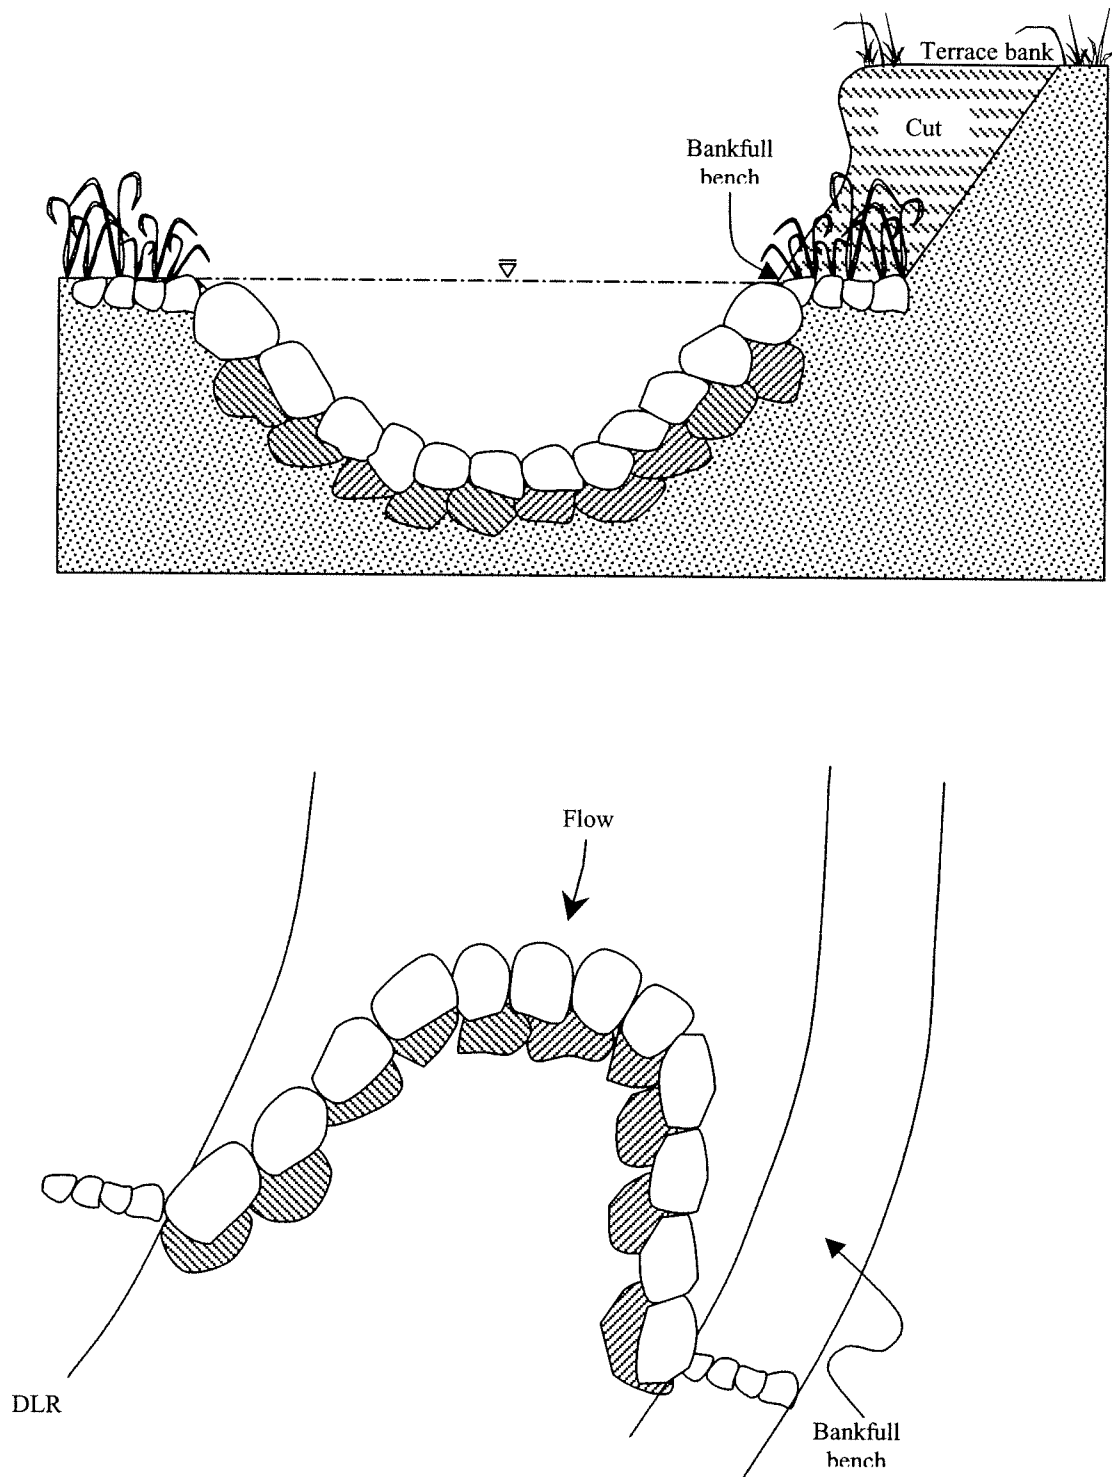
Example of a boulder Cross-Vane and constructed bankfull bench
